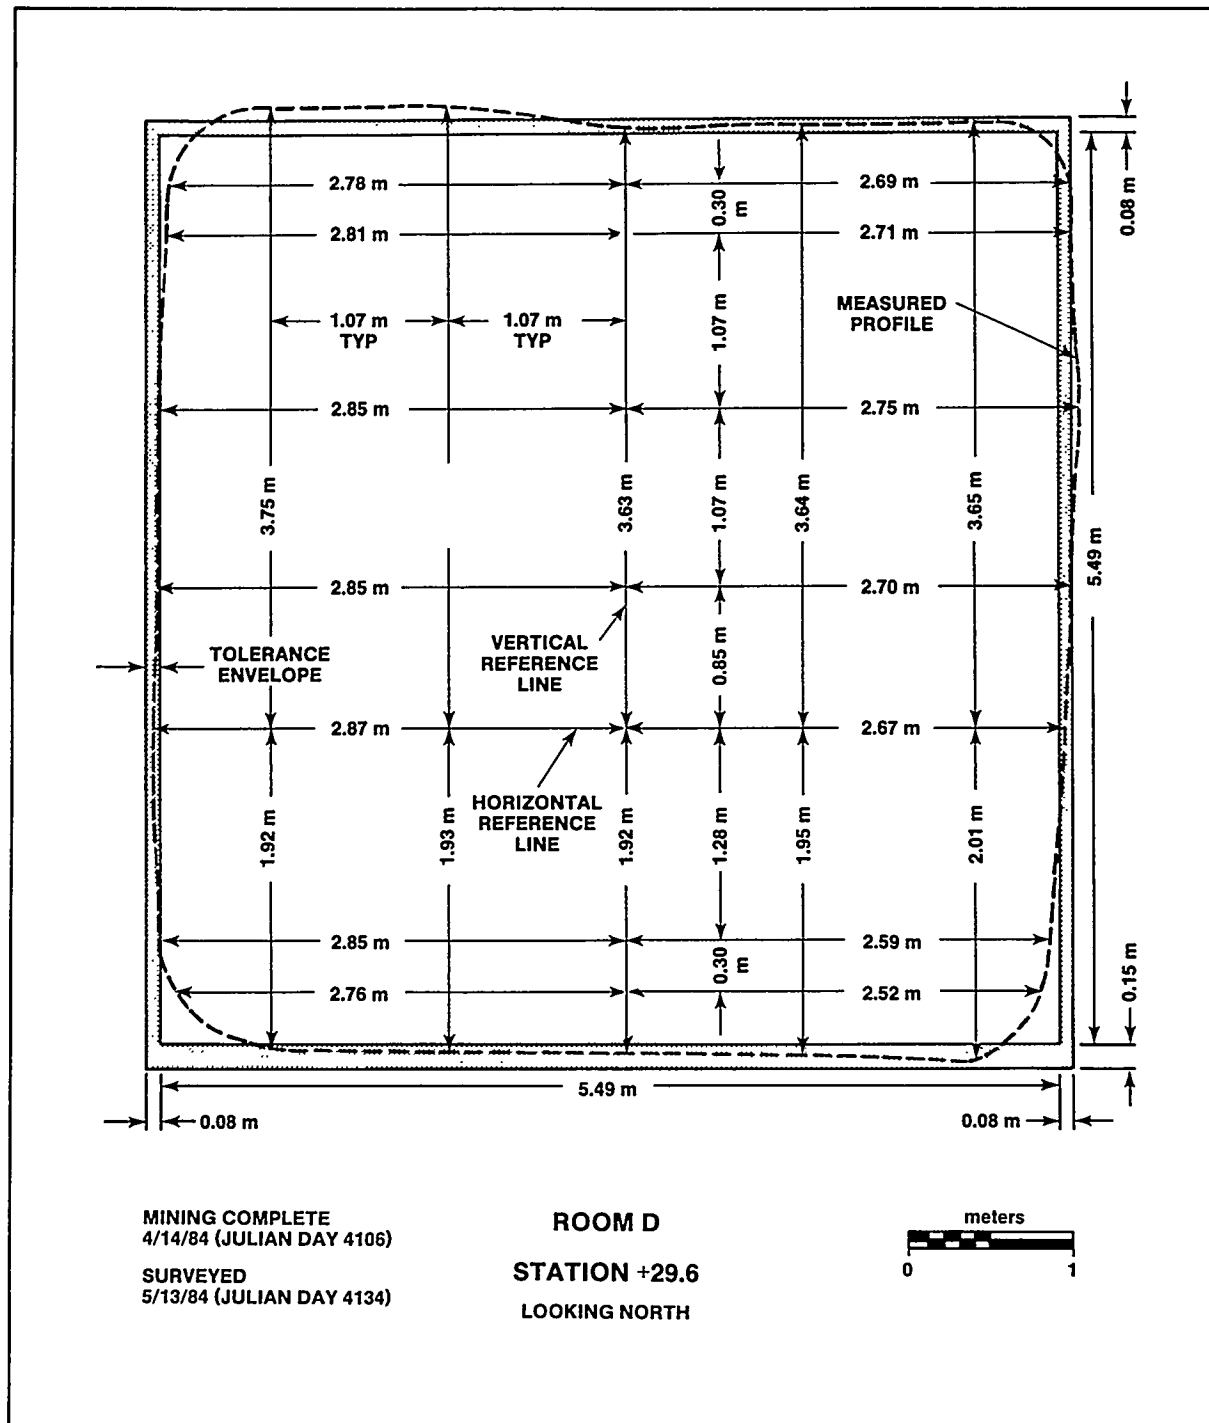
As-Built Cross Section of Station +29.6 m, Room D
